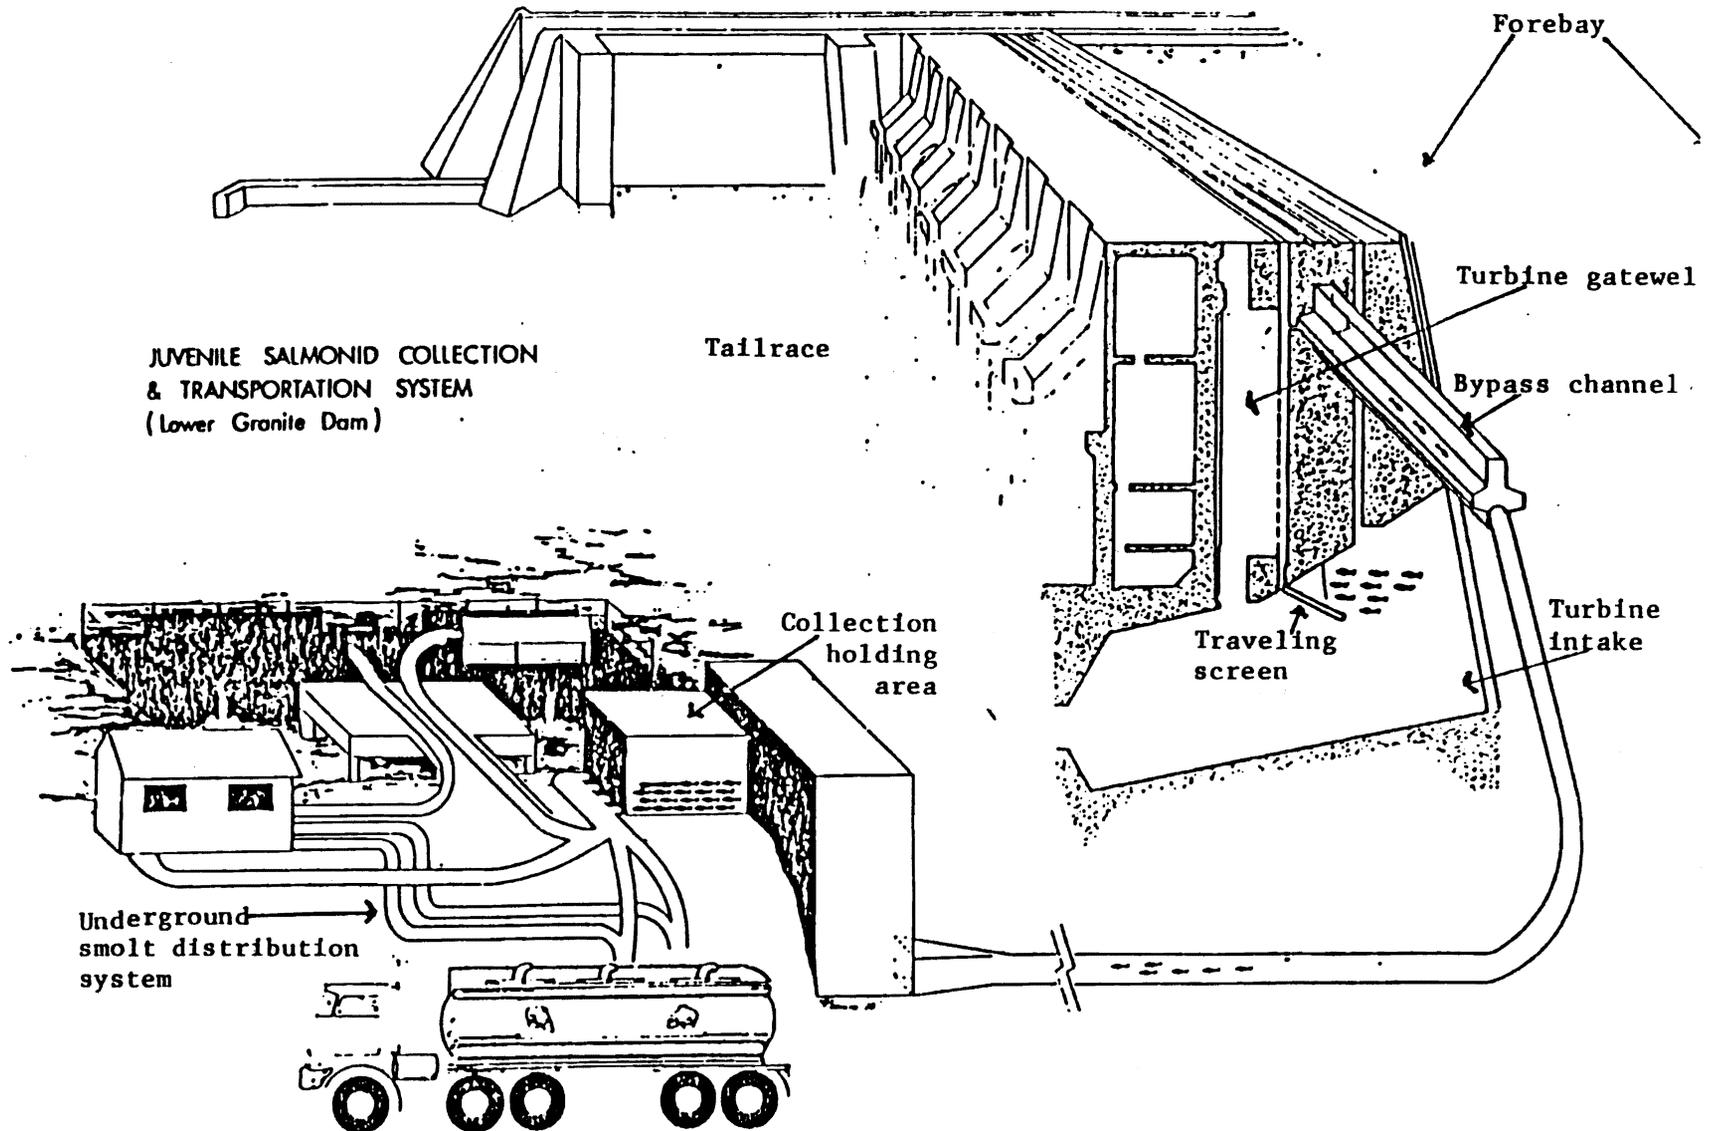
A cross section of a powerhouse at a major collector dam showing the typical collection and transport system including traveling screen placement, bypass channel and pipe to tailrace, holding ponds, and distribution system to trucks or barges.
